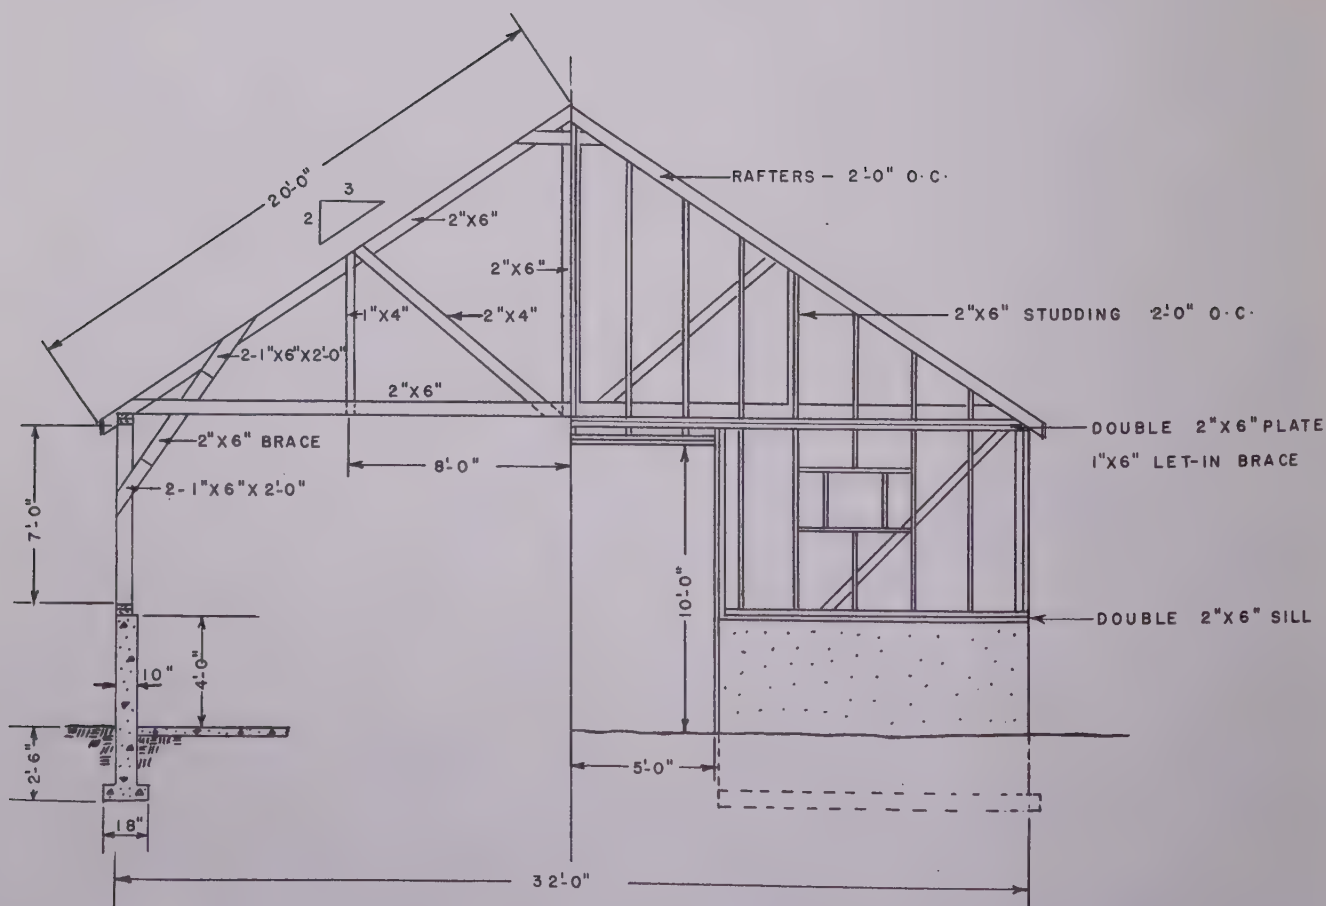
Half section and half end framing of gable-roofed loose-housing barn.
